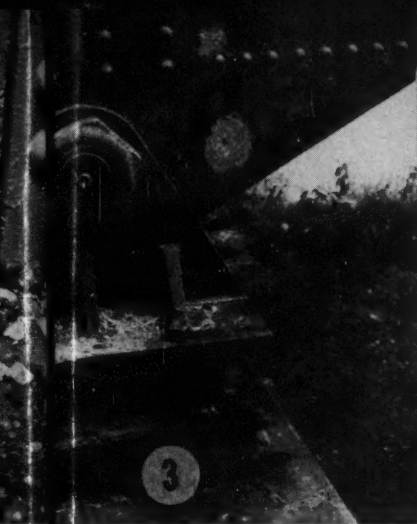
Bearing and footing of highway bridge across the Missouri River on Nebraska-South Dakota border is an example of paint failure and accumulation of dirt and other contaminants on bridge footing.
